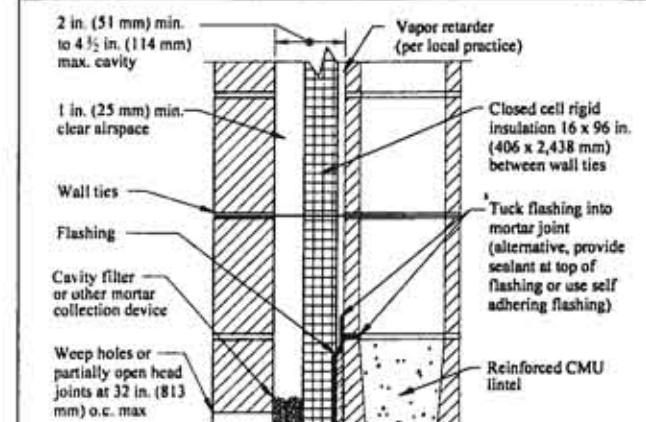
Flashing Cavity Walls at Boad Beam Locations
